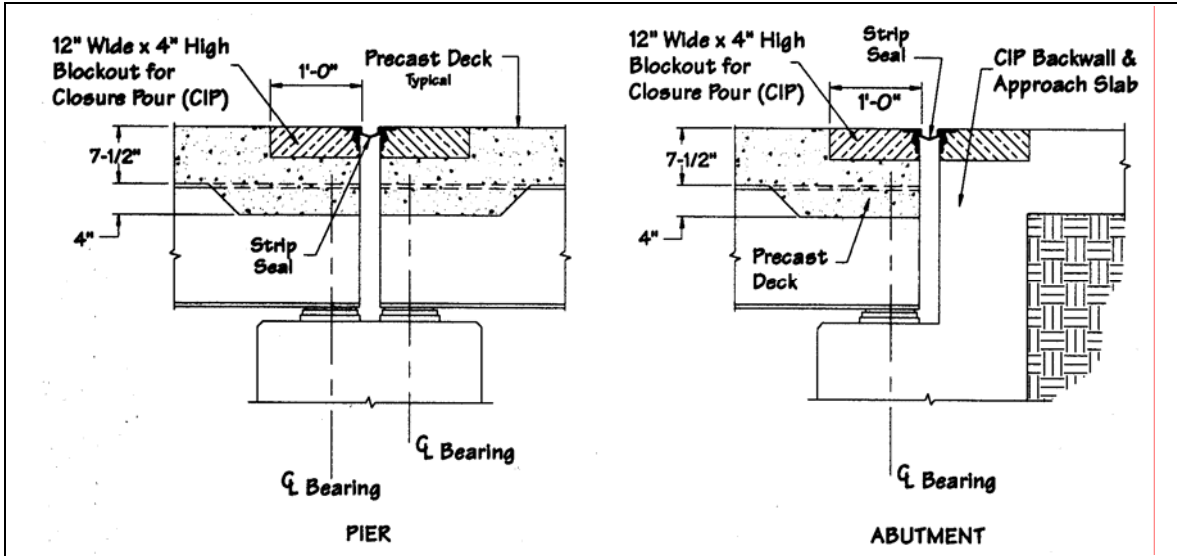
Typical joint detail with strip seal (The Fort Miller Co. Inc., 1998)
